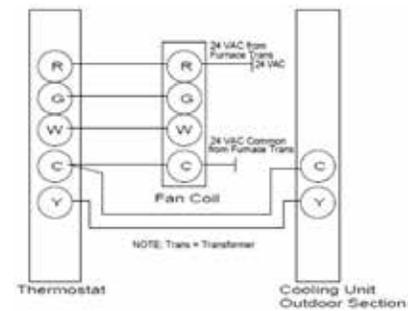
Heat/Cool Thermostat Connections - Single Thermostat & Single Transformer in Air Handler
